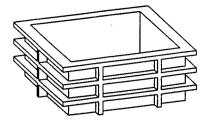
Tank with cross-ribbed horizontal and vertical stiffeners
